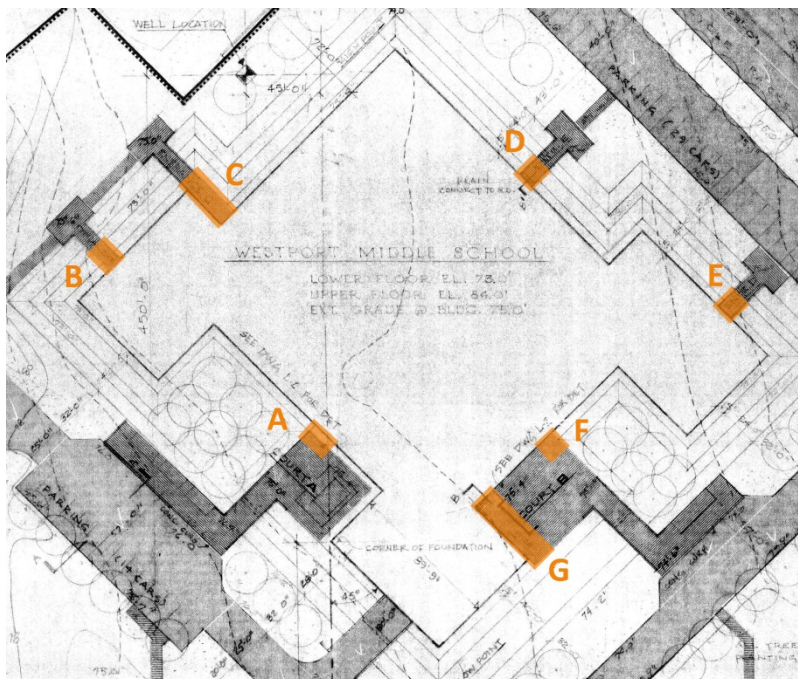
Exterior concrete walkways at building entrances / exits. [From 1968 Drawing L-1]
